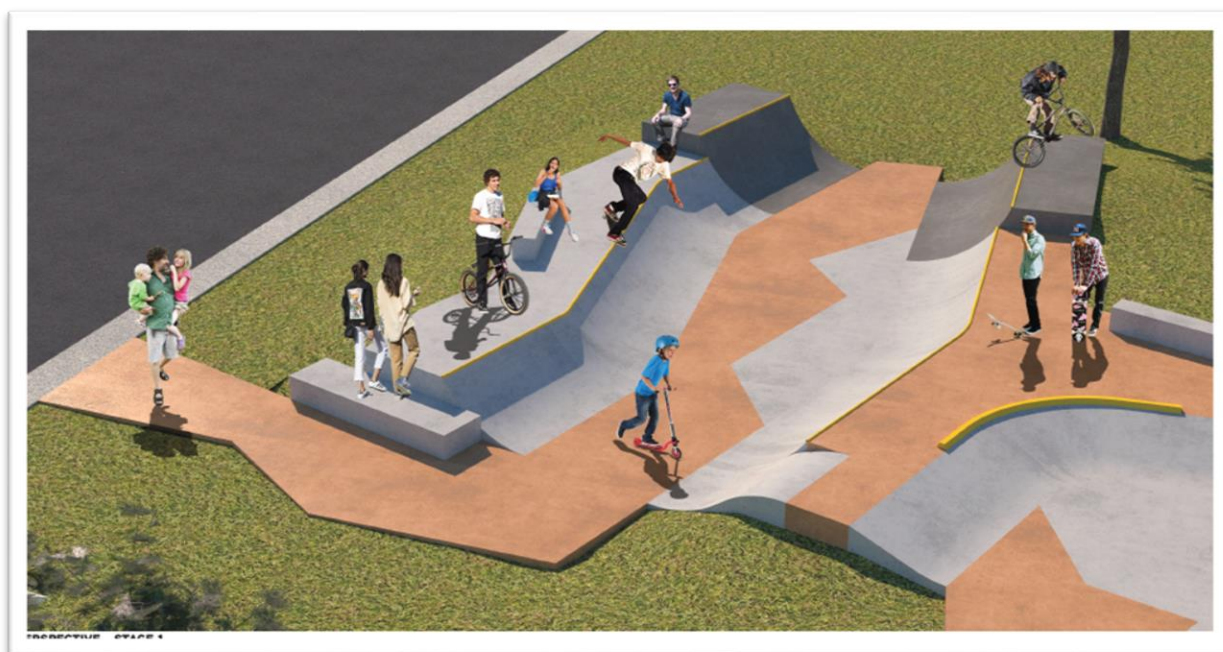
Concept Plans for Local Skatepark at Crawfordville Park, Stage 2
